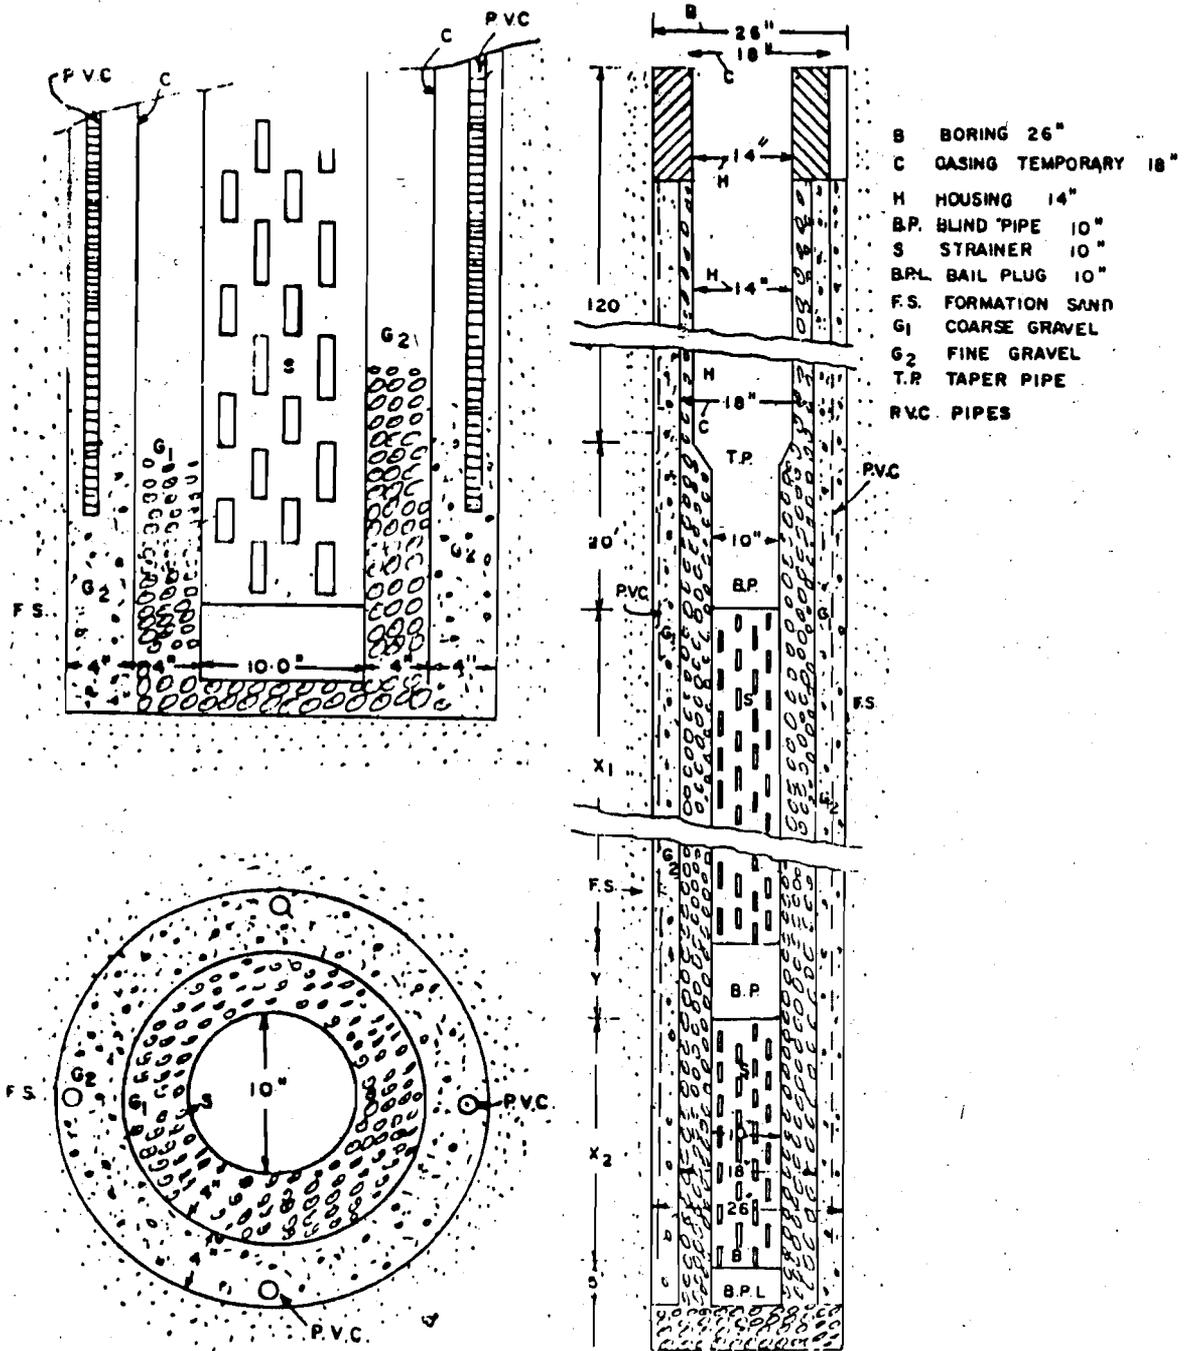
Installing PVC pipes during tubewell construction.
